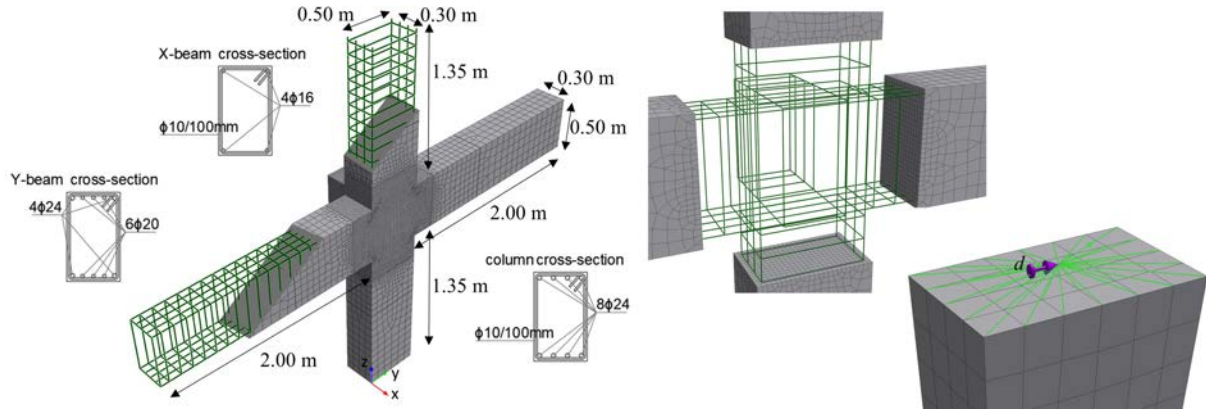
Numerical model with details of the geometry, the steel rebars and the rigid links at the column head
